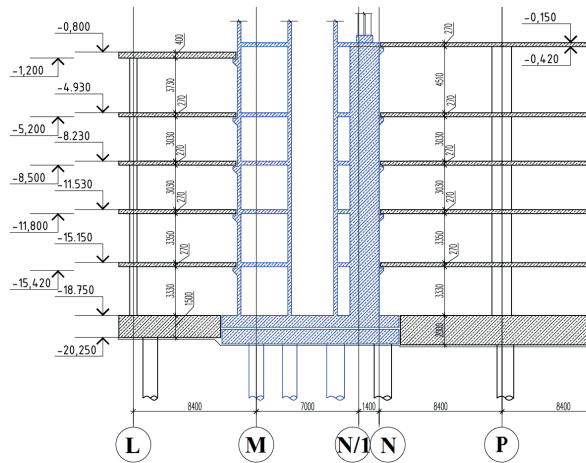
Cross-sectional plan of a five floors basement. New reinforced columns are colored in blue, existing load bearing structures are colored in black
